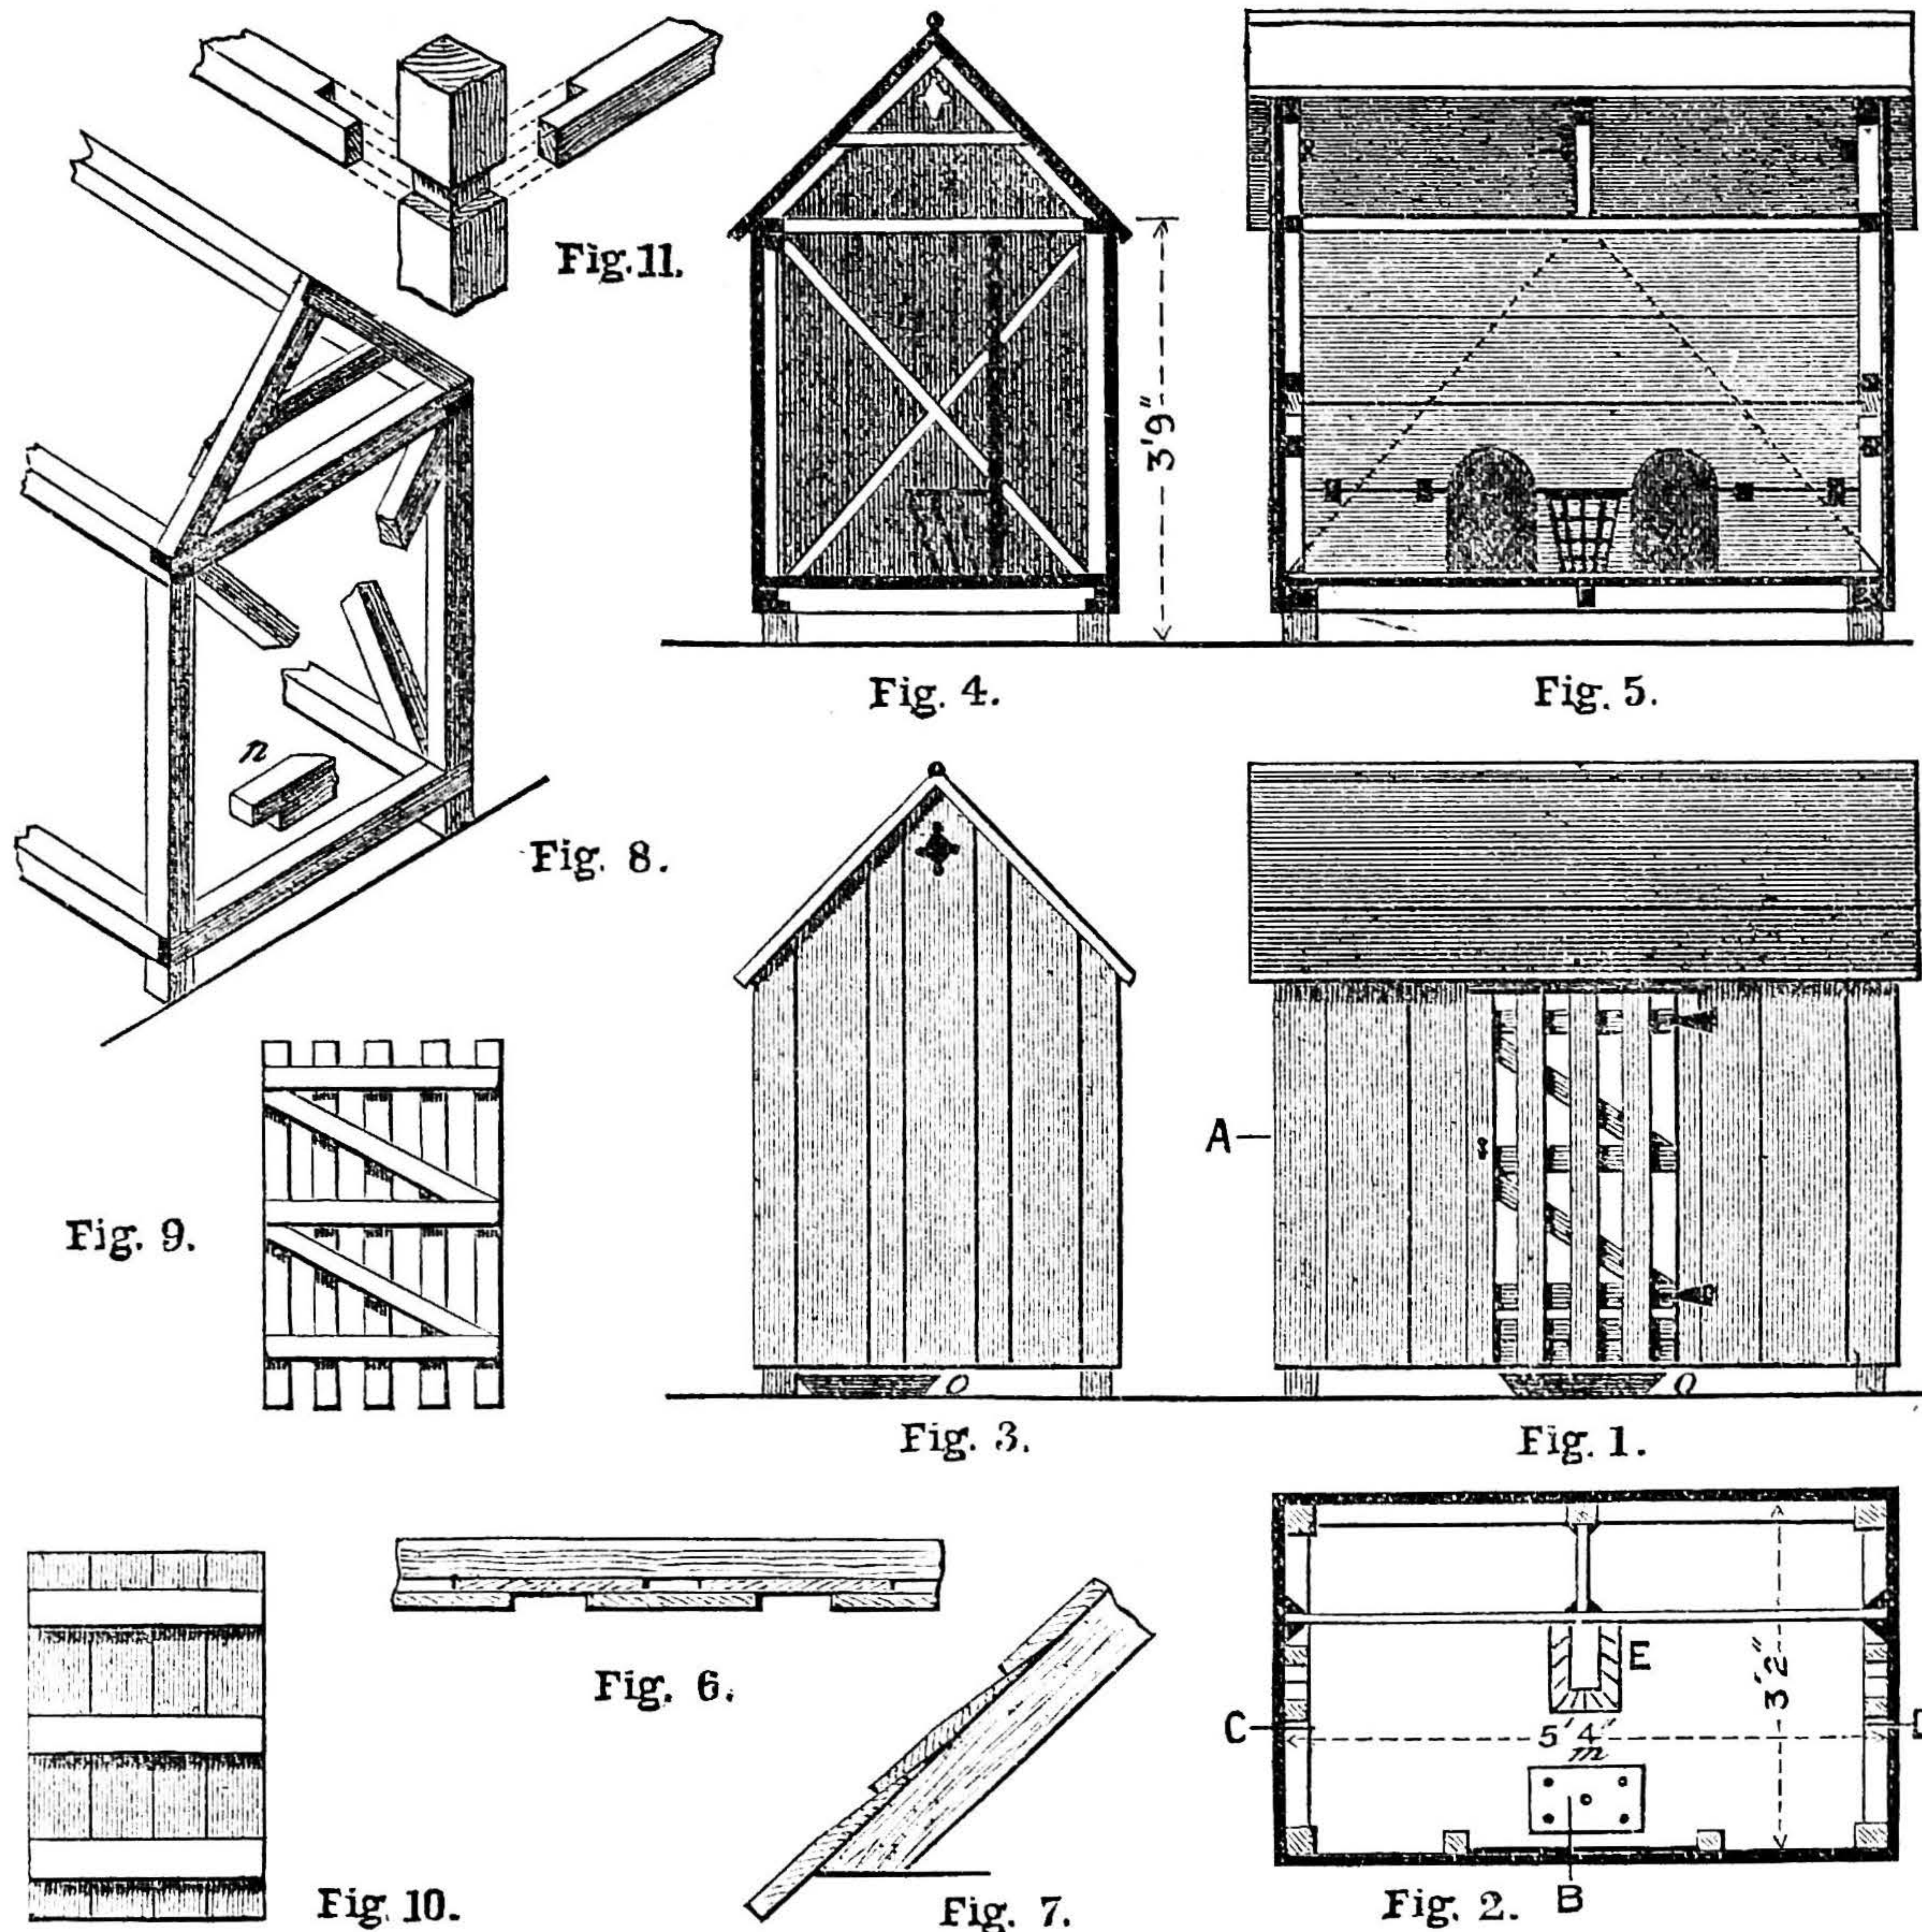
They are kept up a few inches from the ground, and the boarding cut flush with their lower sides, to give ventilation underneath, and to admit of the refuse-box being used. The top runners are halved at the corners, and nailed down on the posts. The door-posts and back-post may be mortised and tenoned into the sills, or they may be put in with square joints, cheek-nailed, as directed for our workshop.
